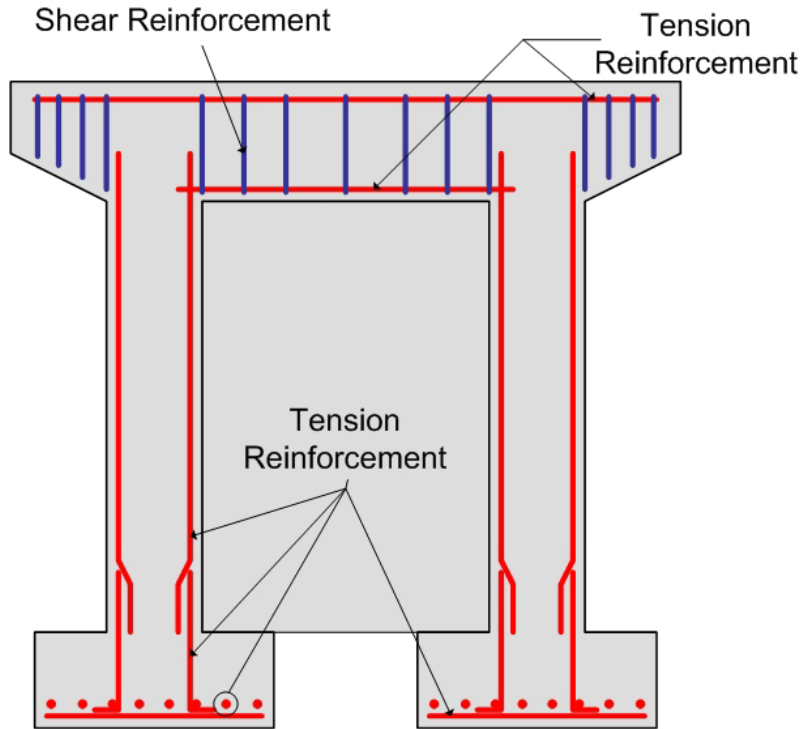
Primary Reinforcement in Column Bent with Web Wall
